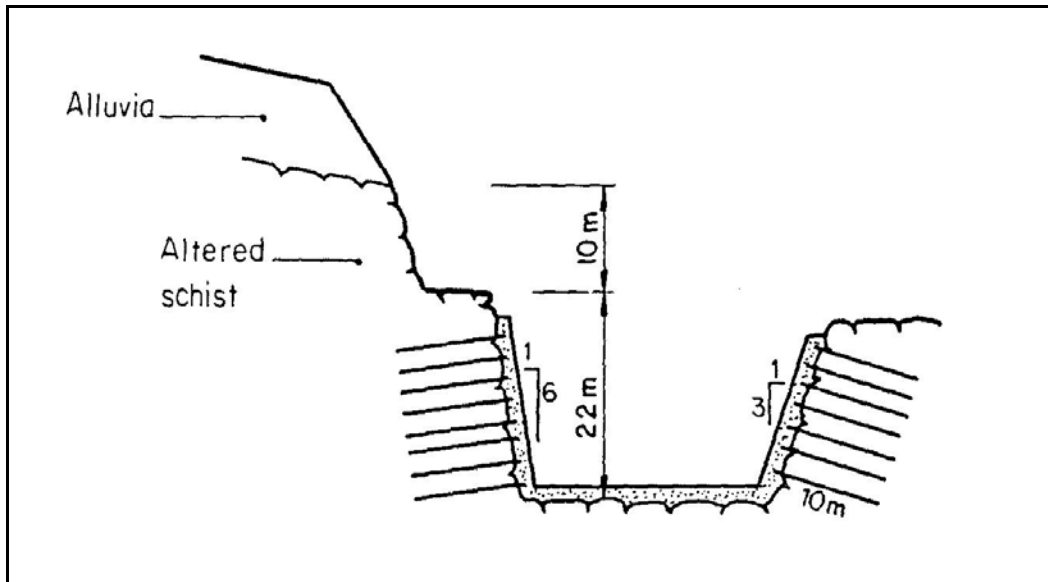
Overflow spillway of Notre Dame de Commier Dam, France, 1961 (Bonazzi and Colombet, 1984)
